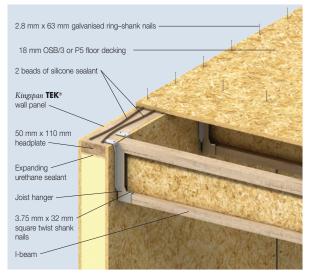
Installation of Floor Deck (Option 1 - Joist Hangers)
